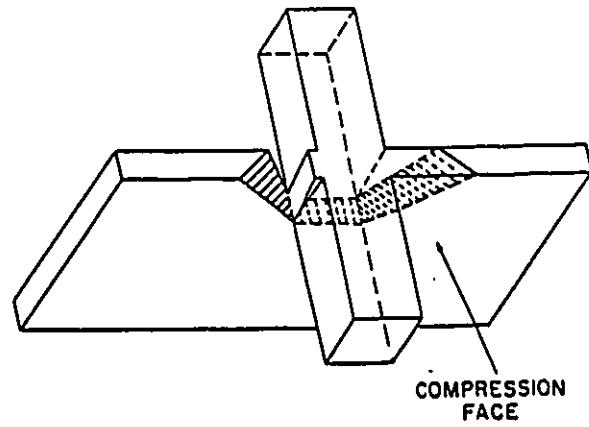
Failure surface around edge columns proposed by Hawkins (Dilger 1989)
